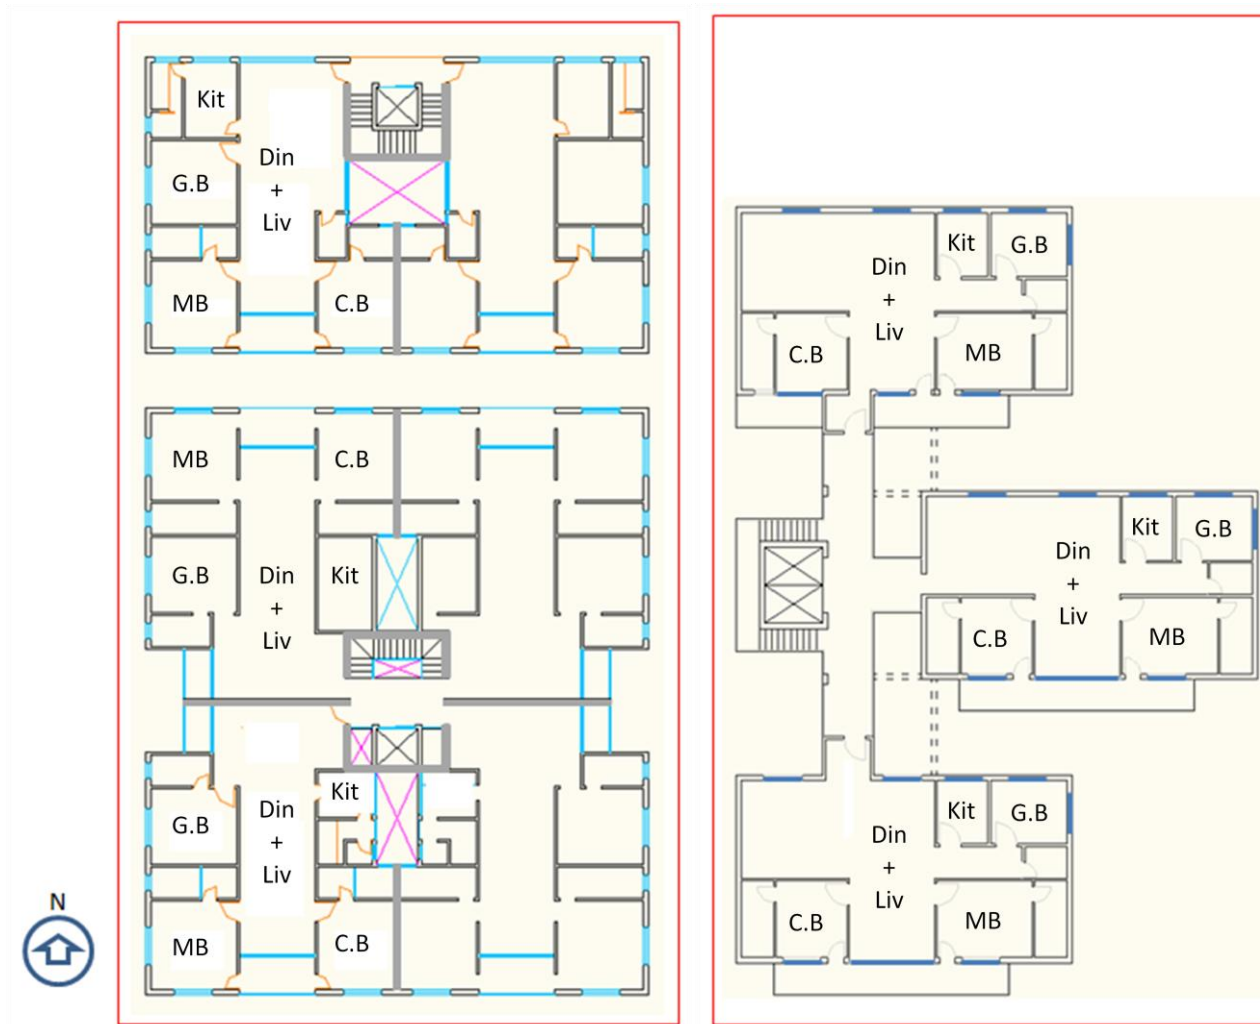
Floor plans of the studied apartment building under zoning scheme-1 (left) and zoning scheme-4 (right).
